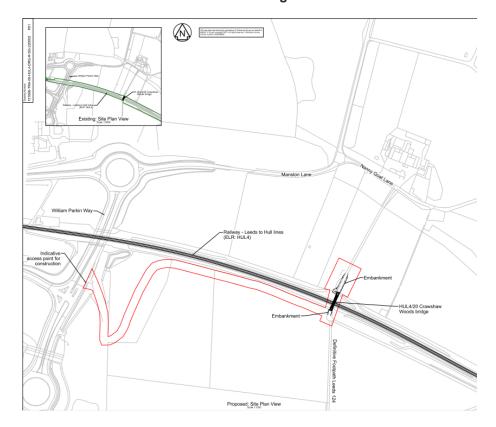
Site layout plan of Works to Raise Crawshaw Woods Bridge
